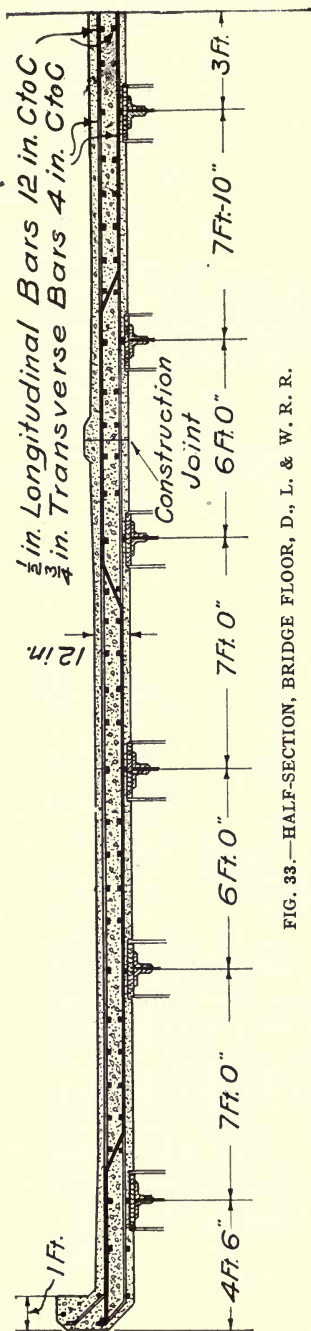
HALF-SECTION, BRIDGE FLOOR, D., L. & W. R. R.
